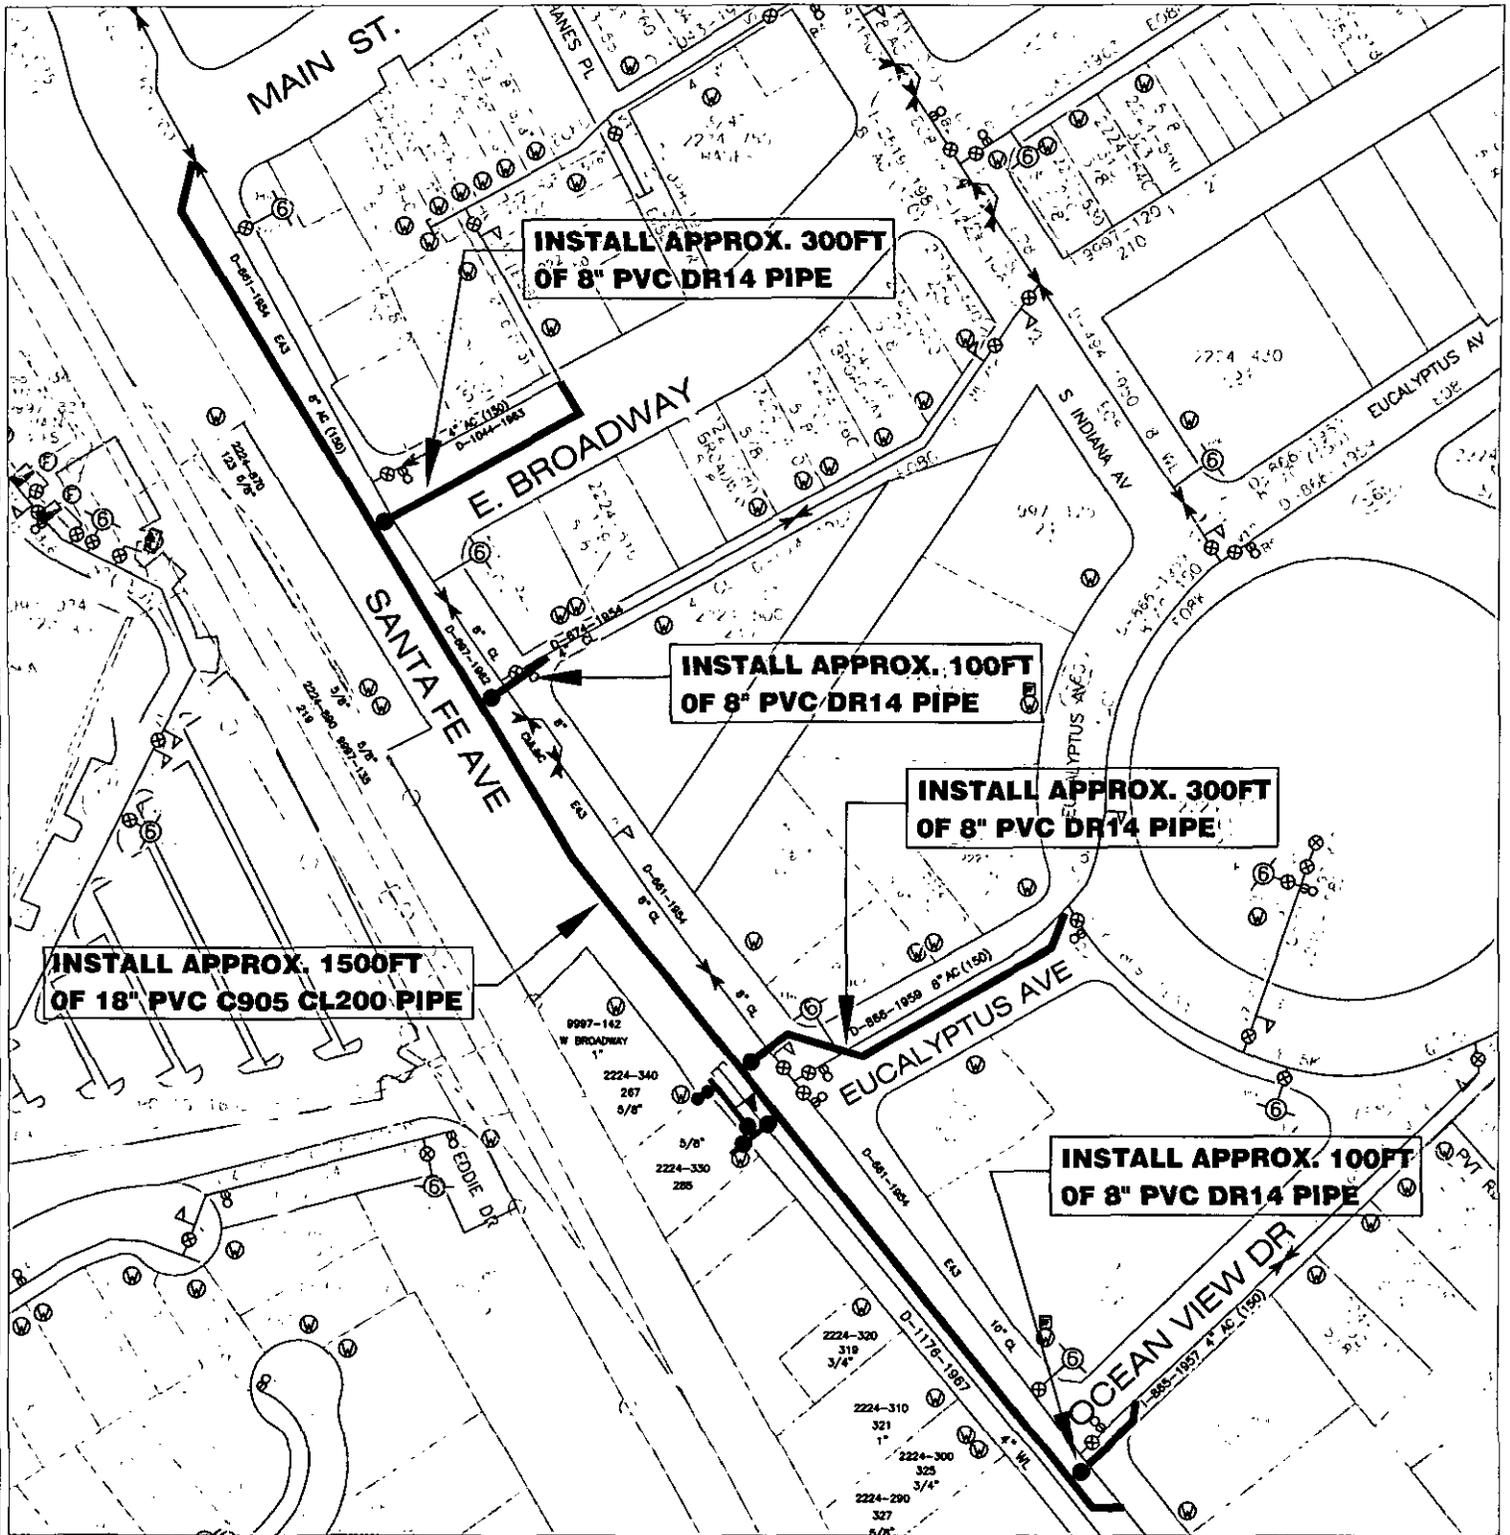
DETAILED REPORT: The City of Vista’s Paseo Santa Fe Streetscape Improvement Project will reconstruct the street section and reduce the width of South Santa Fe Avenue from Main Street to Oceanview Drive from four lanes to two lanes. This project consists of other City improvements including installing on-street public parking, installing traffic circles, and widening sidewalks. Since the City’s contractor will complete 100 percent of the road improvements, there will be no District force work involved in this project other than District inspection of the water facilities. The District will reimburse the City for the District’s portion of the construction.
